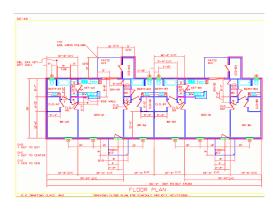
Sample Web-presented Design Drawings of a Construction Project in VRSS
